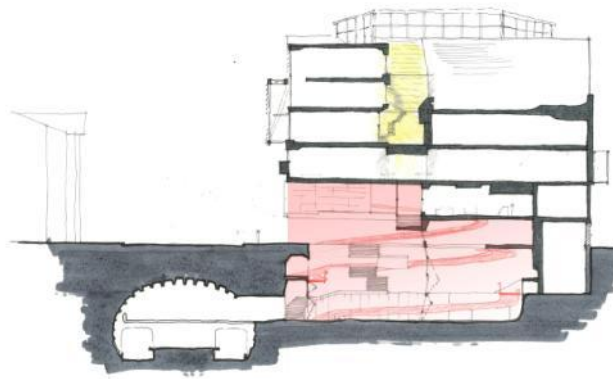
Section at the Metro. The vertical ramping extends into the corner of the building, opening the understory of the building to create a metro mezzanine level plaza.
